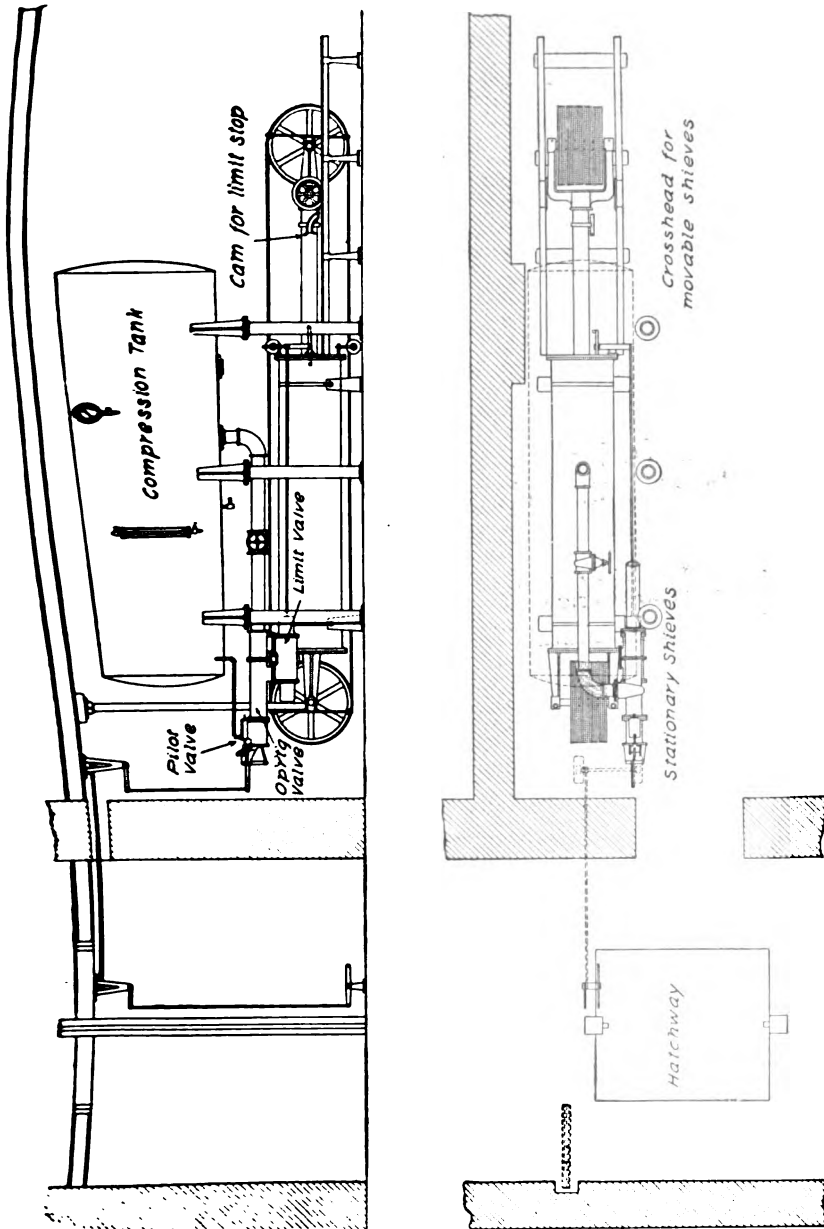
Plan and Elevation of Horizontal Hydraulic Elevator.
